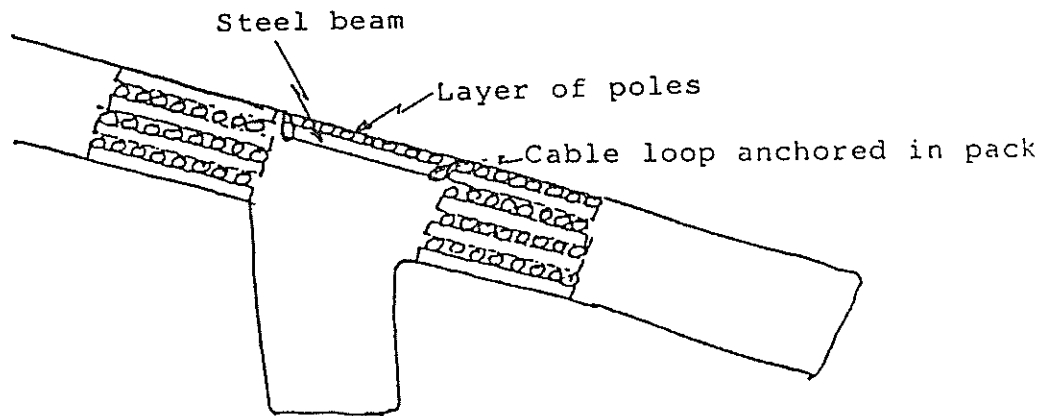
CABLE LOOPS ANCHORED INTO PACK SUPPORT TWO STEEL BEAMS ON WHICH A LAYER OF POLES IS PLACED
